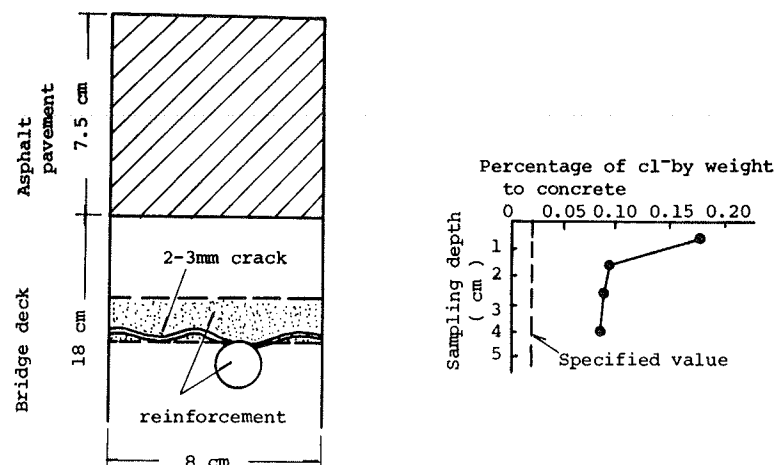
Cl^- content of concrete core of actual bridge deck and crack caused by corrosion of reinforcement.
